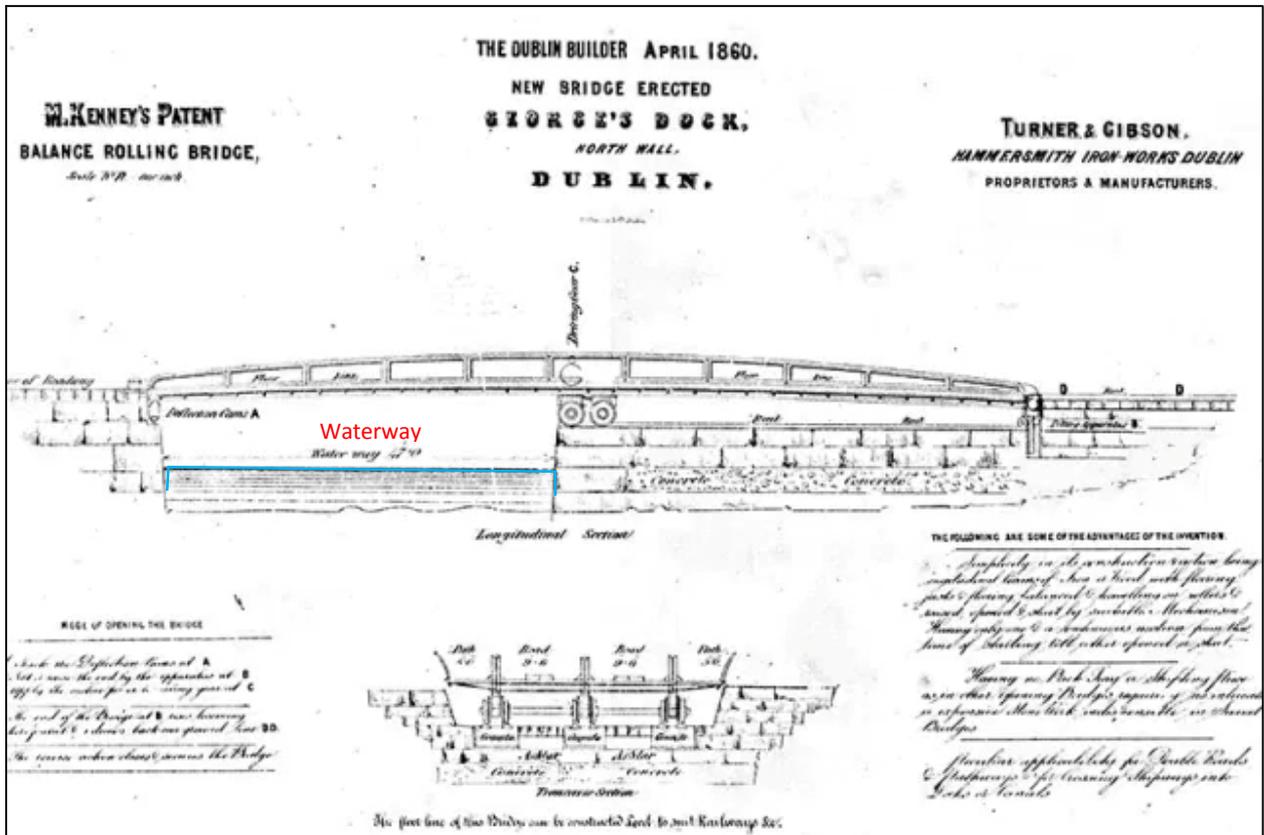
Elevation (looking north) and section of drawbridge over entrance to Dock. (*Dublin Builder*, 1860)
